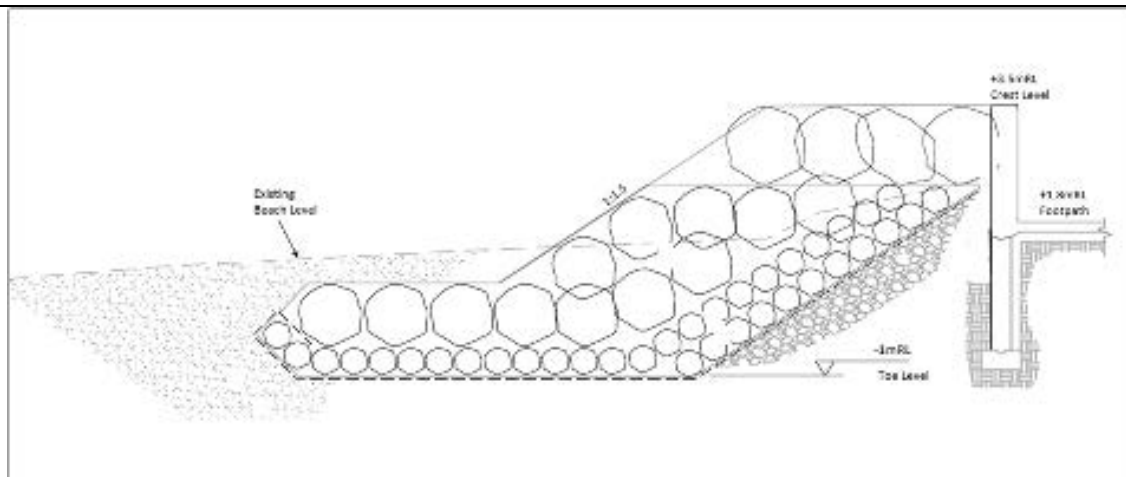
Typical Cross Section of Seawall Concept at Wharf Road Corner.
